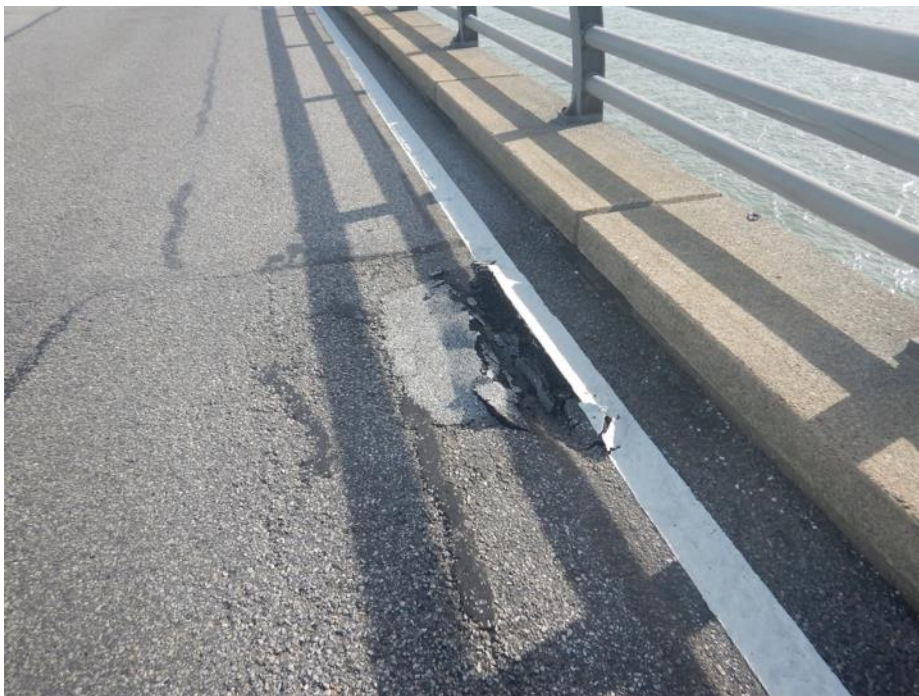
ESB5 Asphalt Wearing Surface - Deck Spall at Patch (Looking Southwest)
